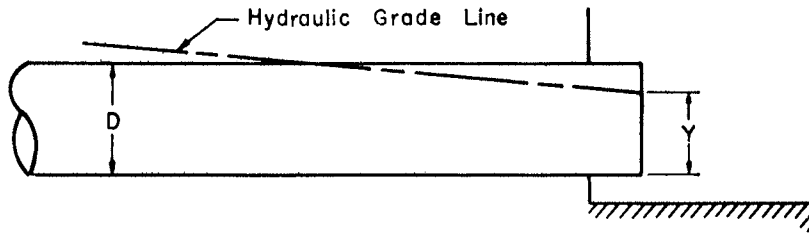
Hydraulic Grade-line Intercepts at Pipe Outlet
